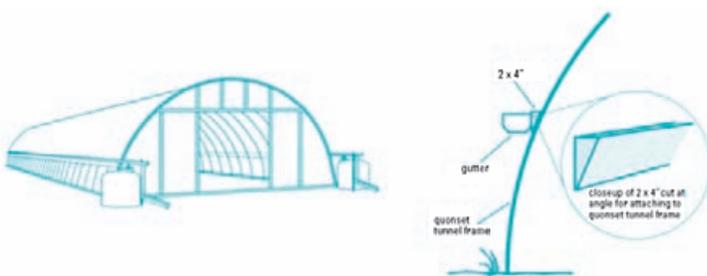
Gutter support board mounted on Quonset (tunnel) greenhouse
